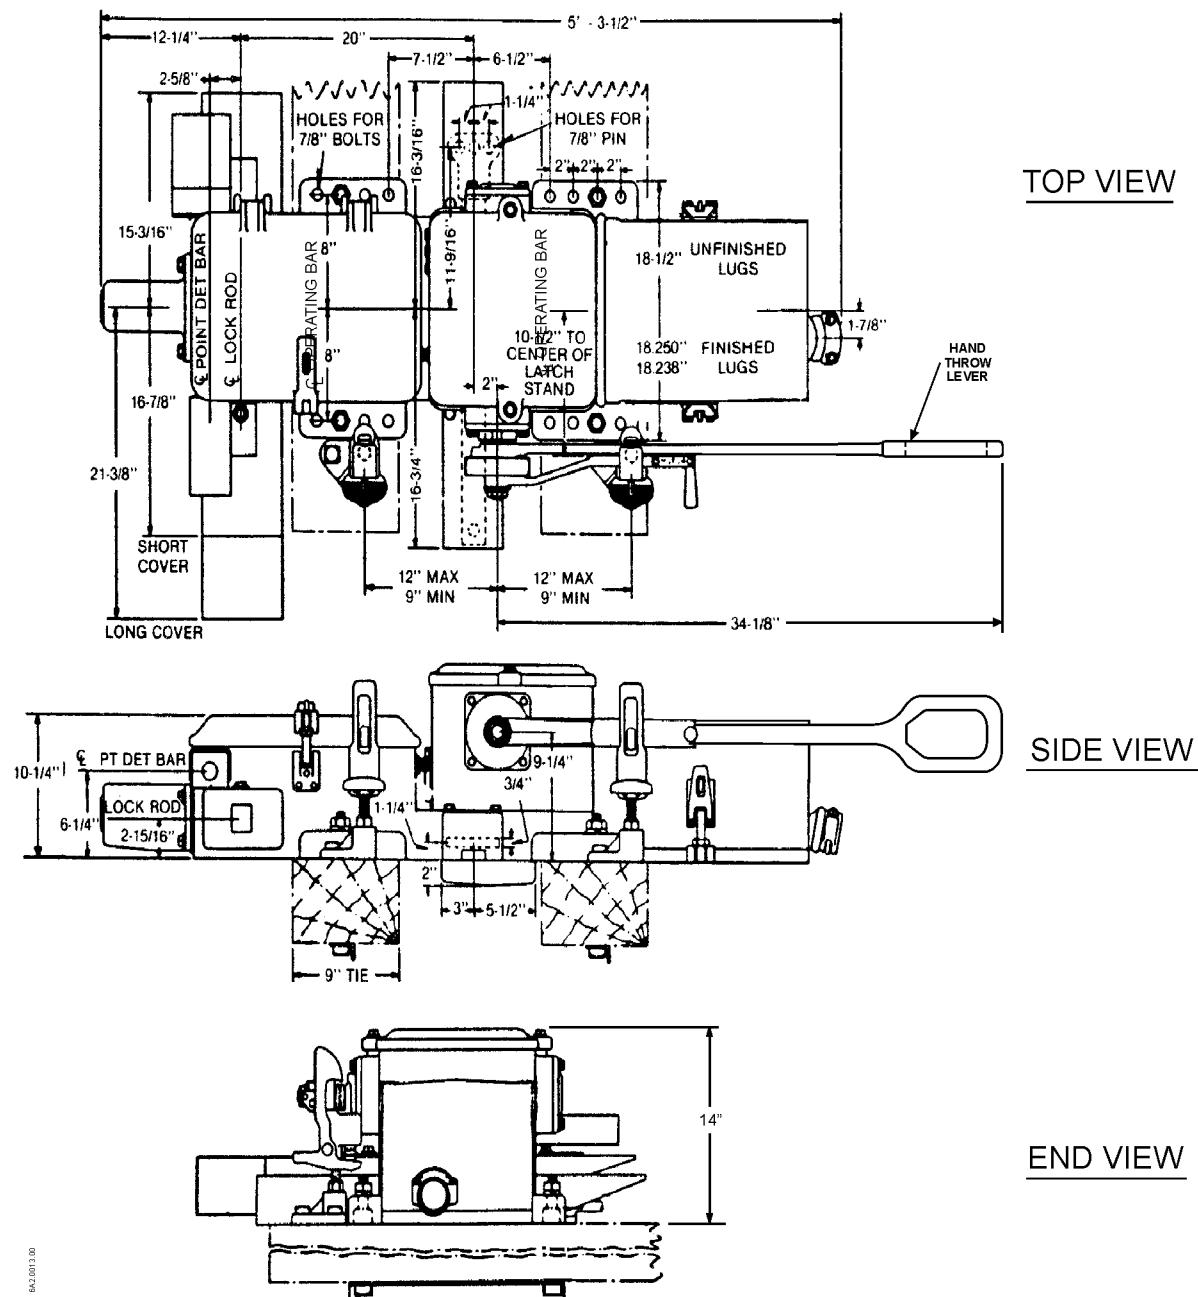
Typical M-23A and M-23B Mounting Plan
